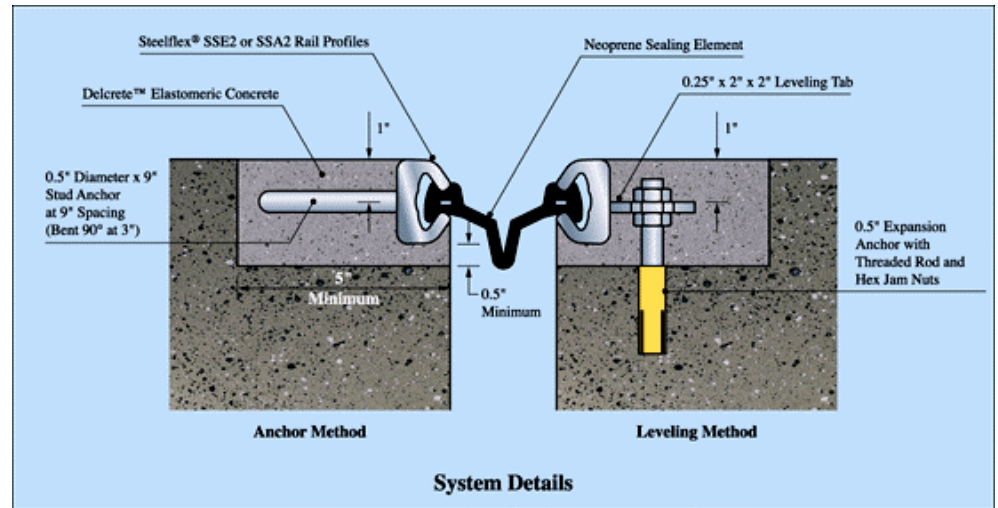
Strip Seal (Drawing Courtesy of the D.S. Brown Co.)
